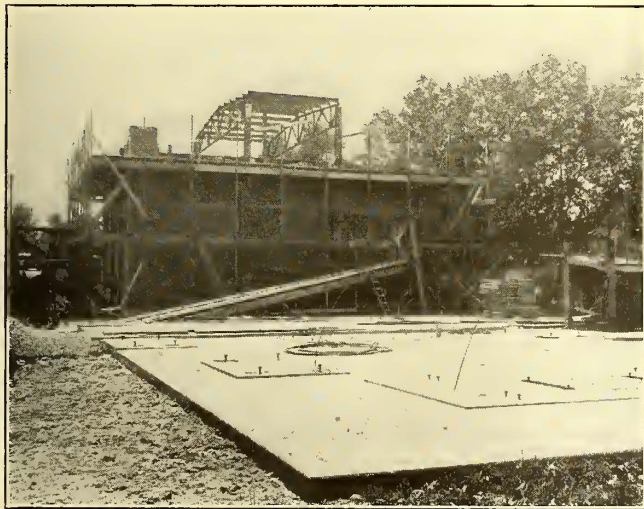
FOUNDATIONS OF THE OUTDOOR SUBSTATION ANCHORAGES
